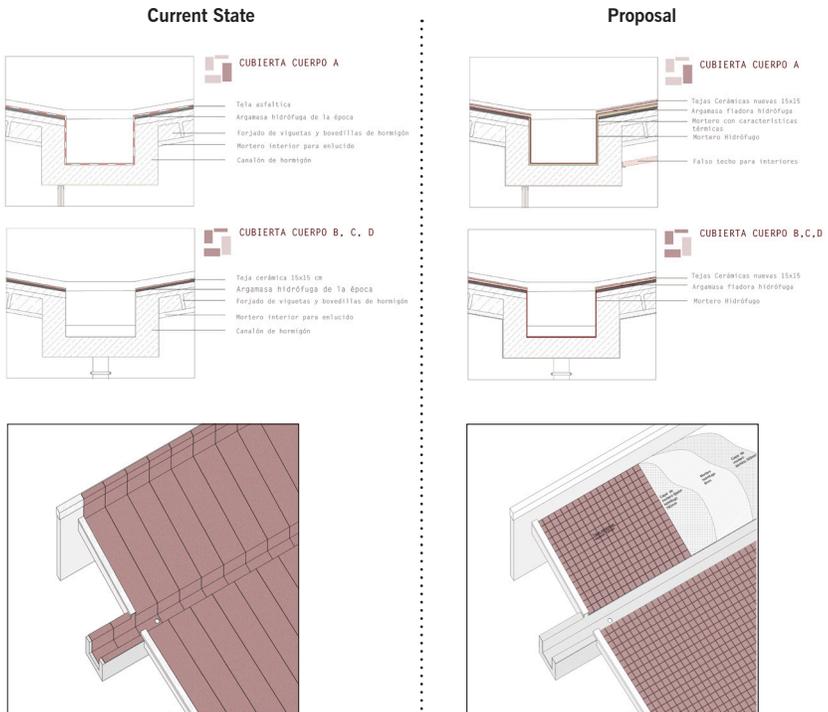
Market's pavilions roofs details on the current state and repair proposal (drawings by María del Carmen Bueno García).
